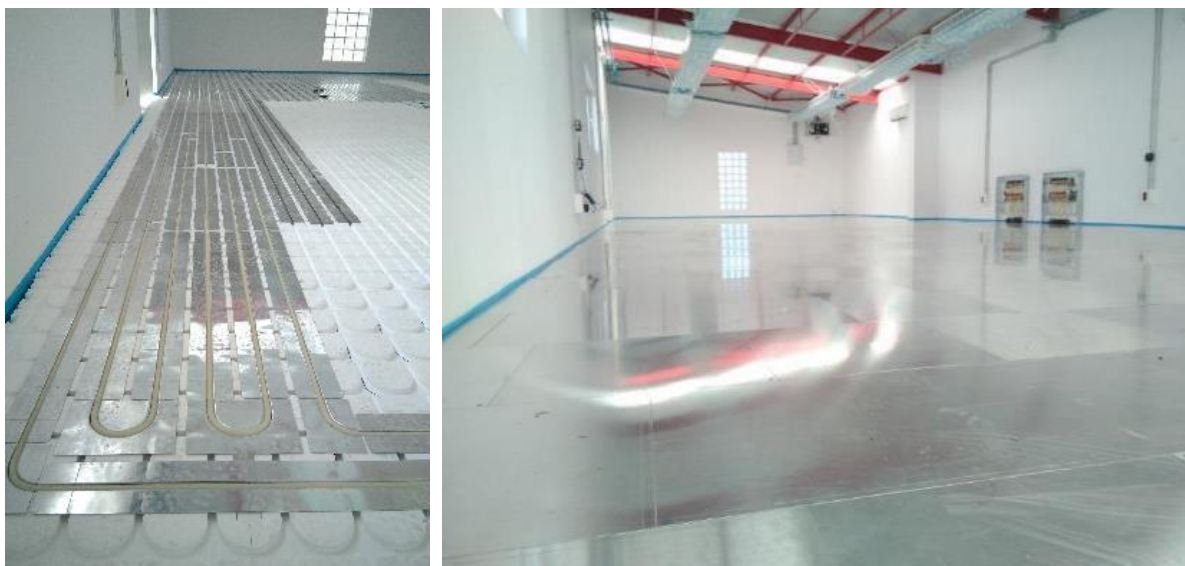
Pipes inside the radiant floor (left) and last layer (metallic) of the radiant floor (right)
